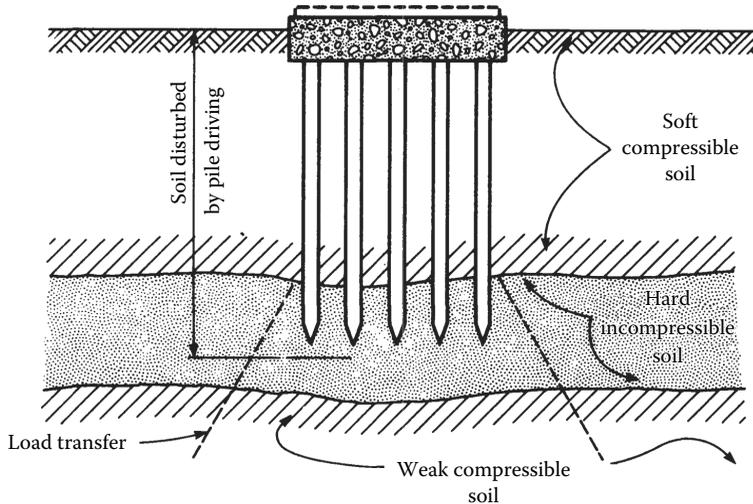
Pile group terminating in hard incompressible soil layer underlain by weak compressible soil.
